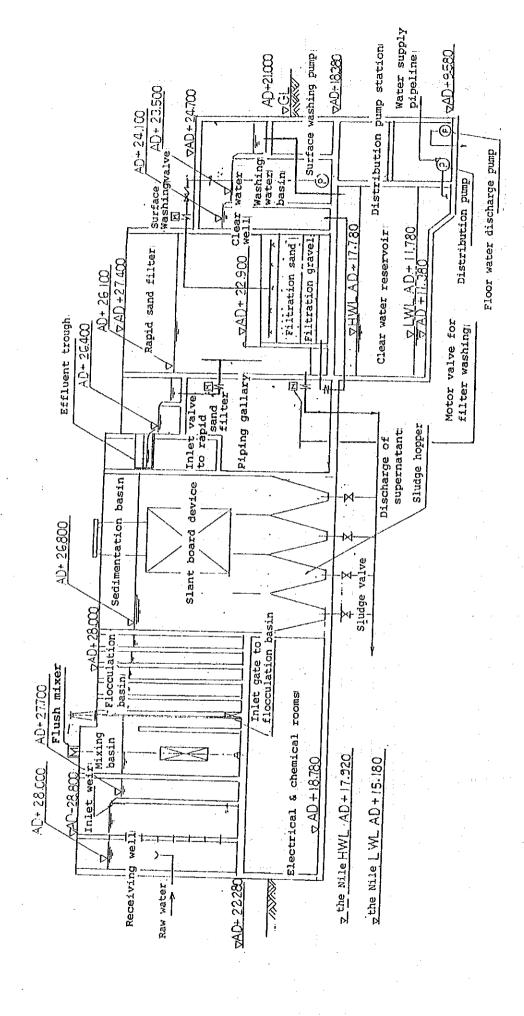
Hydraulic Profile at New Facility Under South Giza Waterworks Expansion Plan
